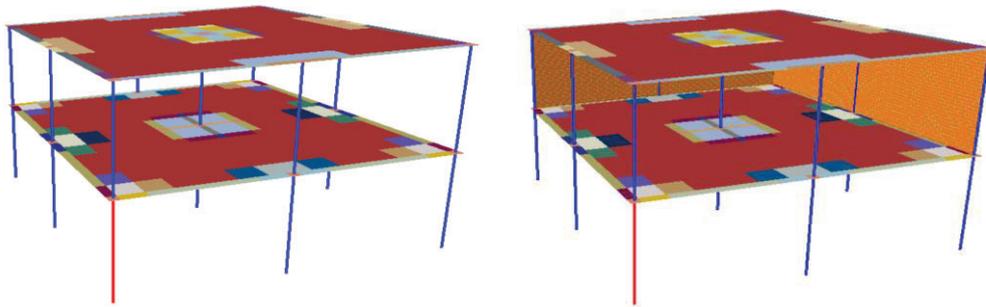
3D view of the FE model without (left) and with infill masonry walls (right).
